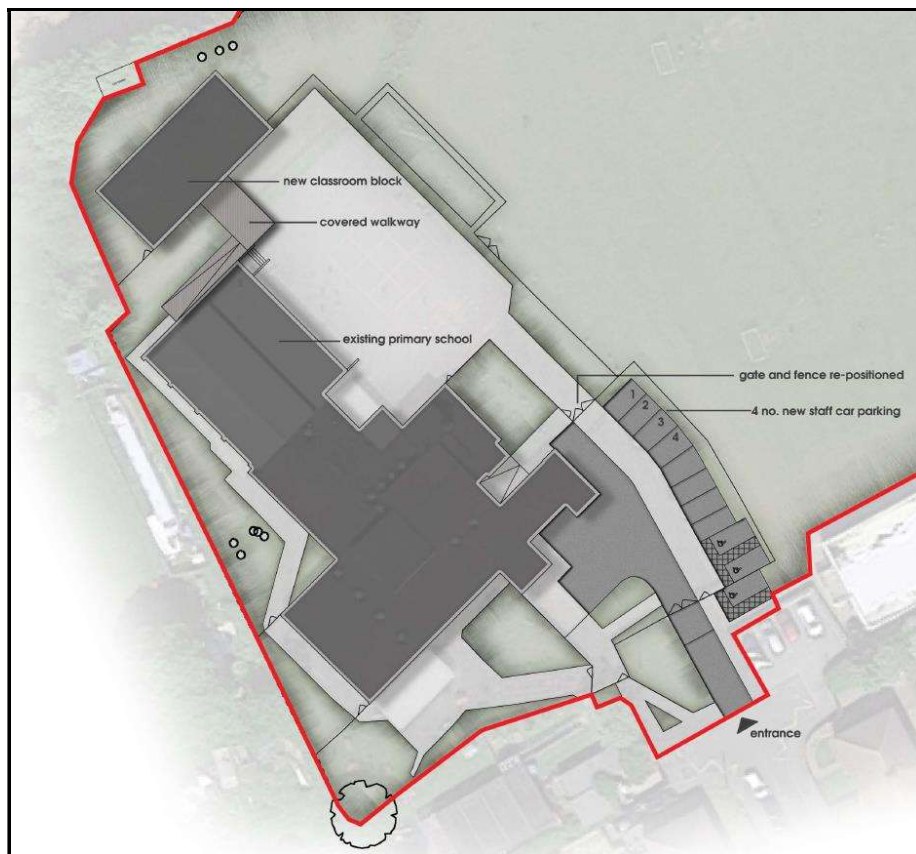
Proposed Site Plan – full drawing within Appendix 1.
